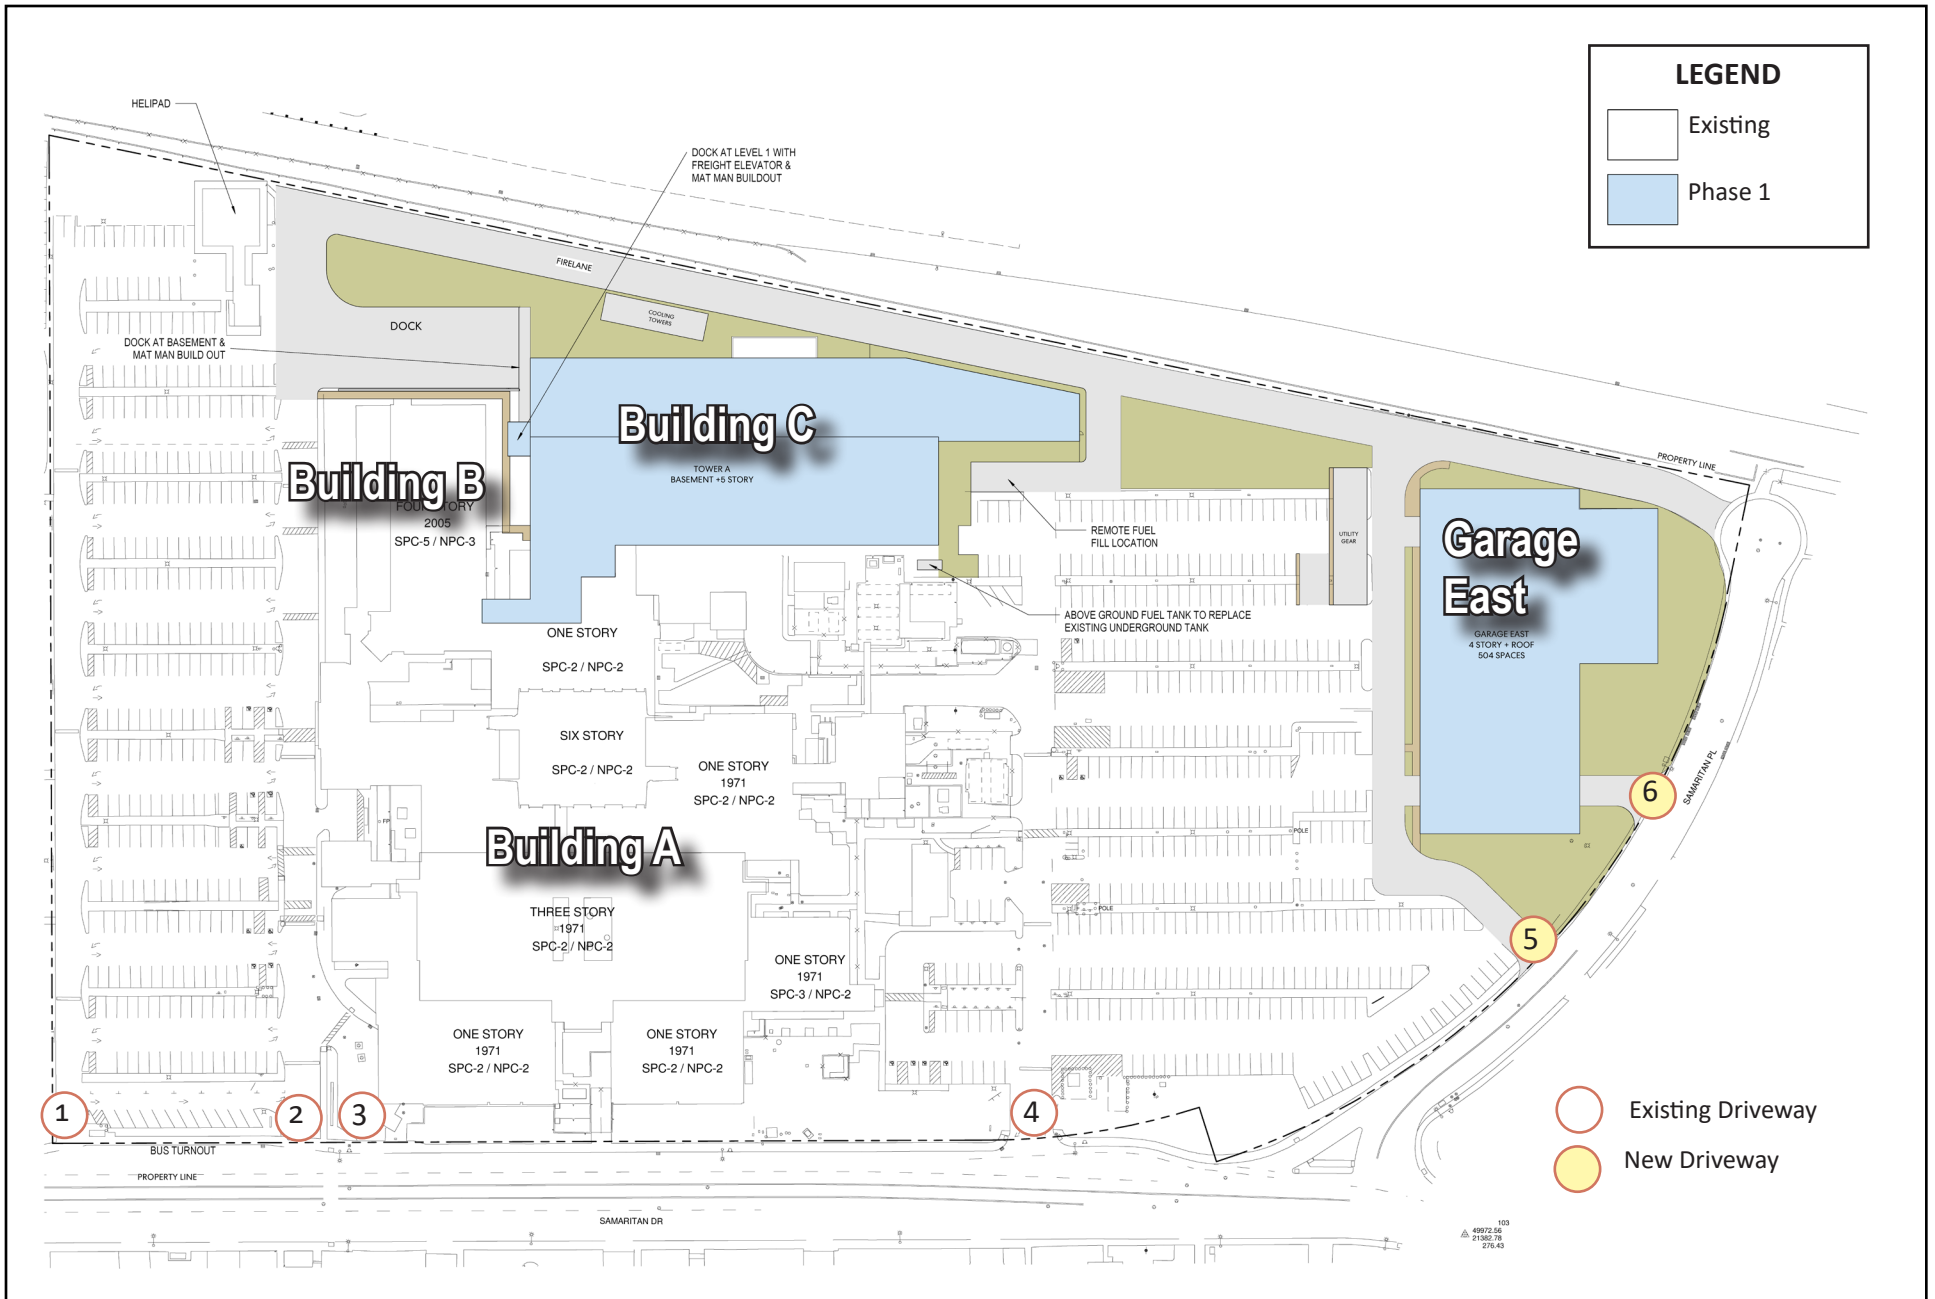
Proposed Project Phase 1 Conceptual Site Plan
